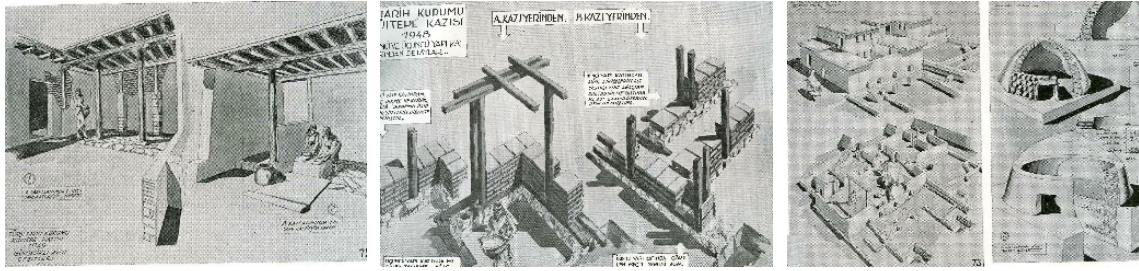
Earthen building drawings of Kültepe (Kaniş-Karum). (M. Akok)
